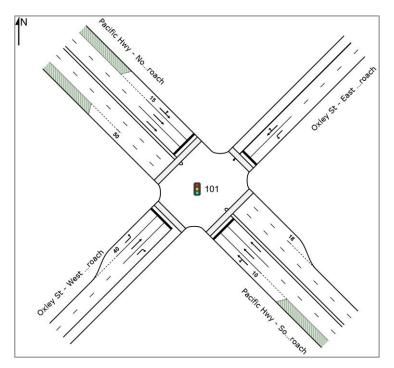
Intersection layout of Pacific Highway/Oxley Street intersection
